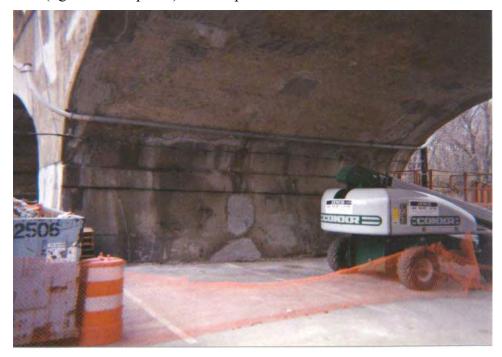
Looking northwest at the east face of the center pier. Note: Concrete repair work done under repair contract in 2000.
